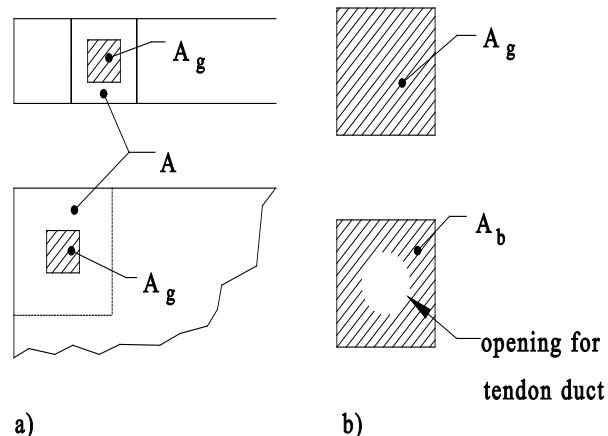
Area of Supporting Concrete Surface in Eq. 5.8.4.4.2-2
